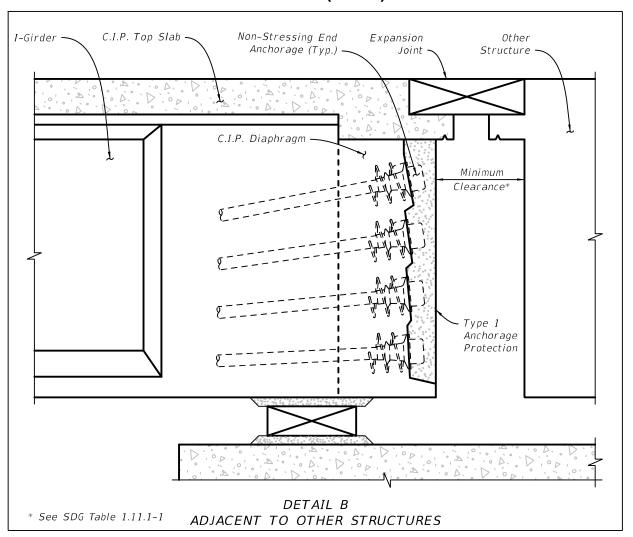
Post-Tensioned Spliced Girder Details - Tendons Internal to the Web (4 of 4)
